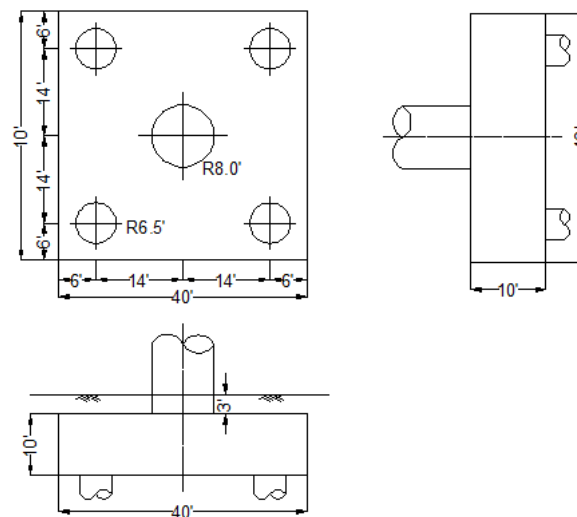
Pile group foundation (2×2) for CHSR pier column
